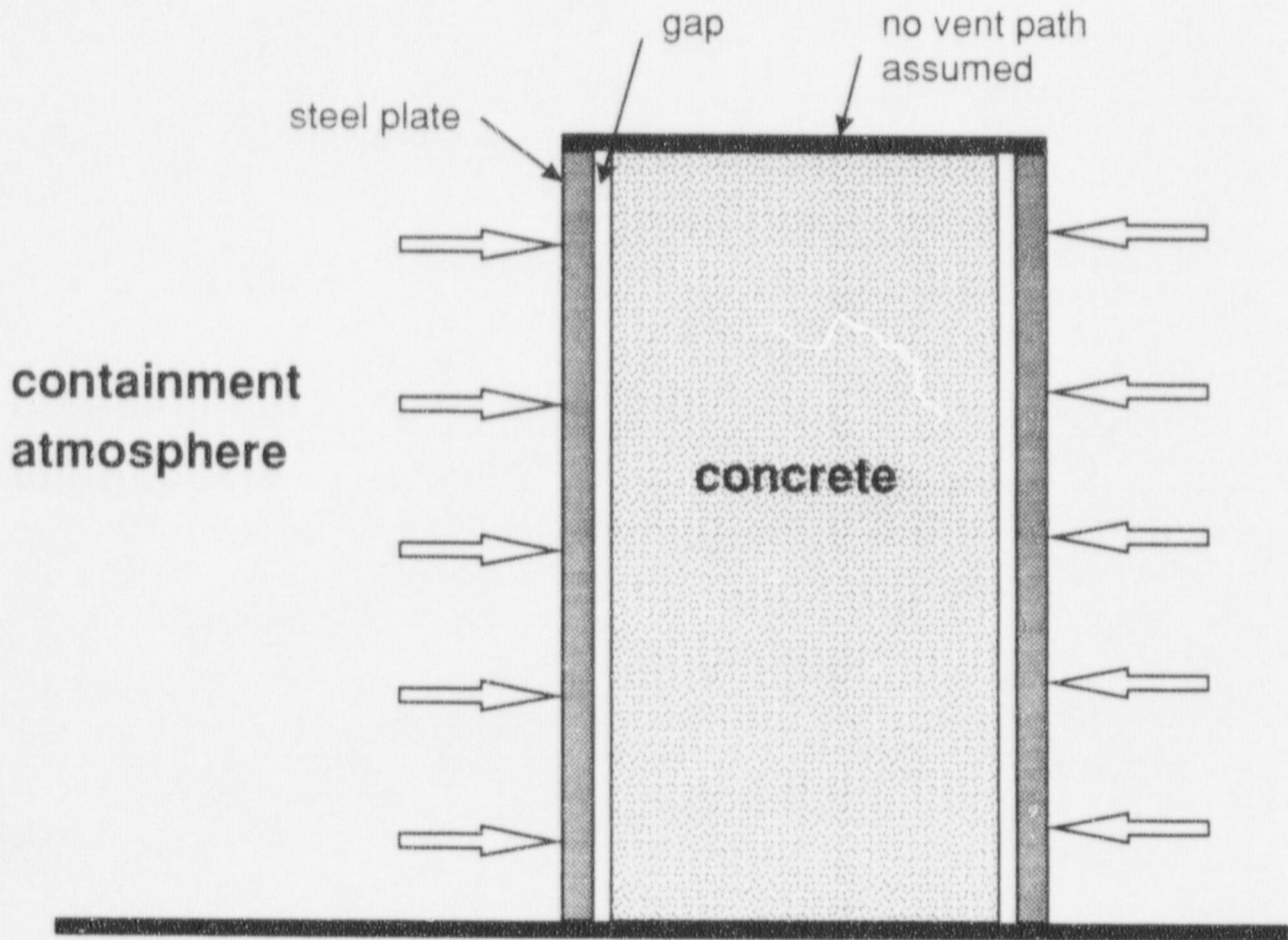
(R1)-1 Steel-Jacketed Concrete Form with Airtight Boundary
